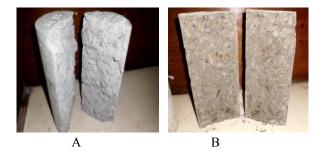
Cylindrical concrete of organic cement (A). Cylindrical concrete of portland cement (B)
